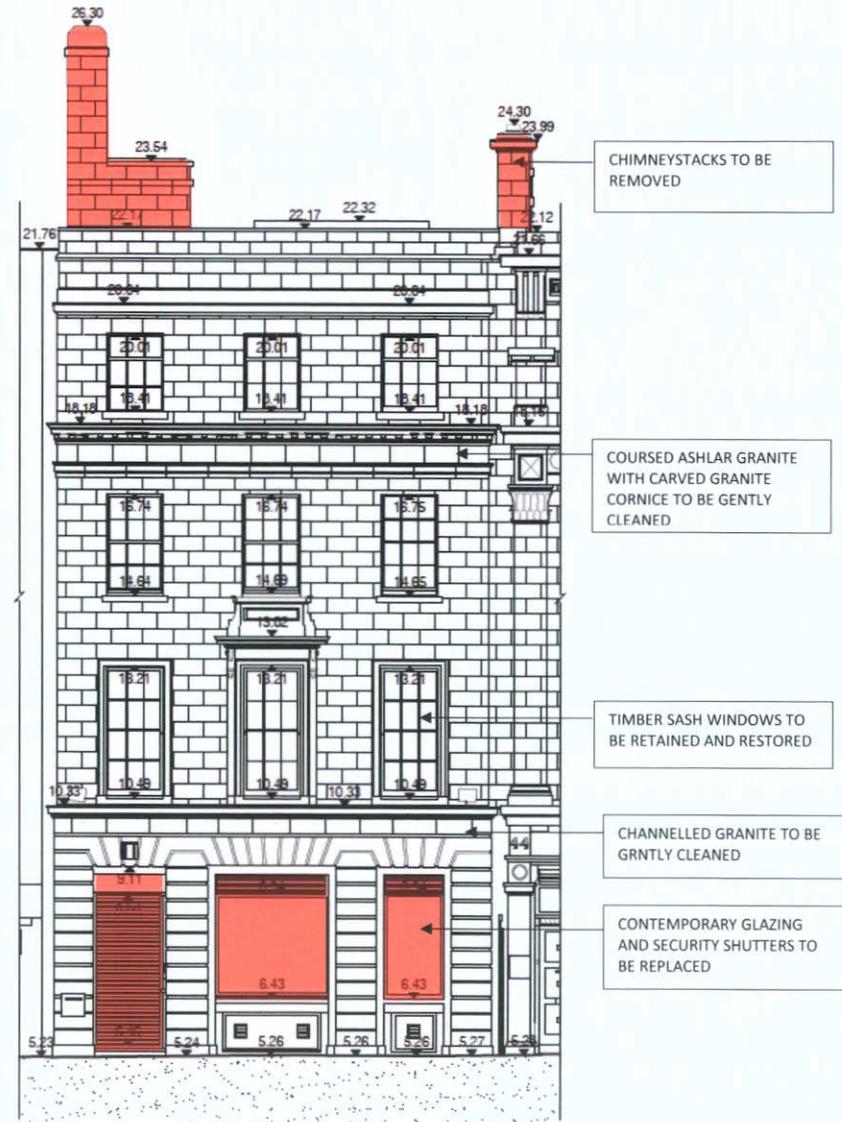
No.45 O'Connell Street Upper. Note: Drawings are not to scale. The drawings within this report are for illustrative purposes only. Please refer to detailed drawings submitted with the application for accurate dimensions and information.
